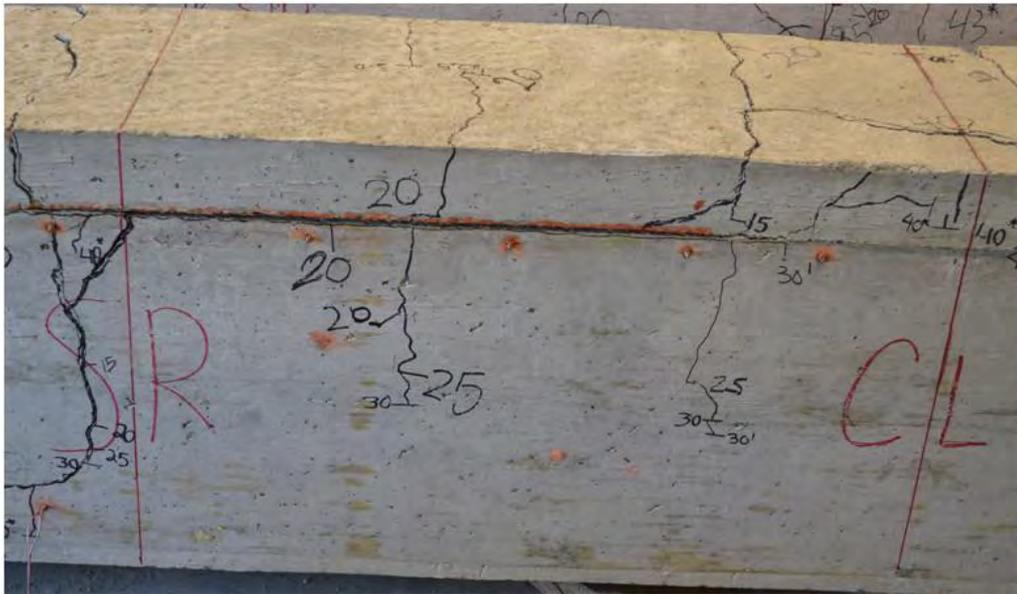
Beam 3 Failure with Wide Horizontal Cracks Along Cold Joint, University of Kansas
